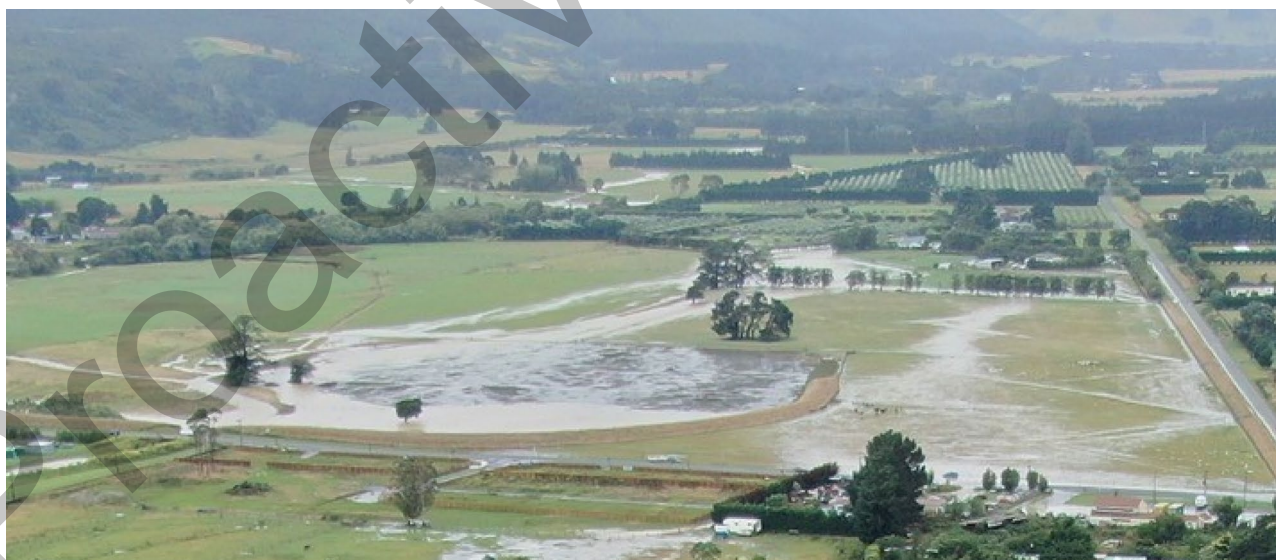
Photo looking north to Harrison Street East detention structure (02 Dec 2018)
